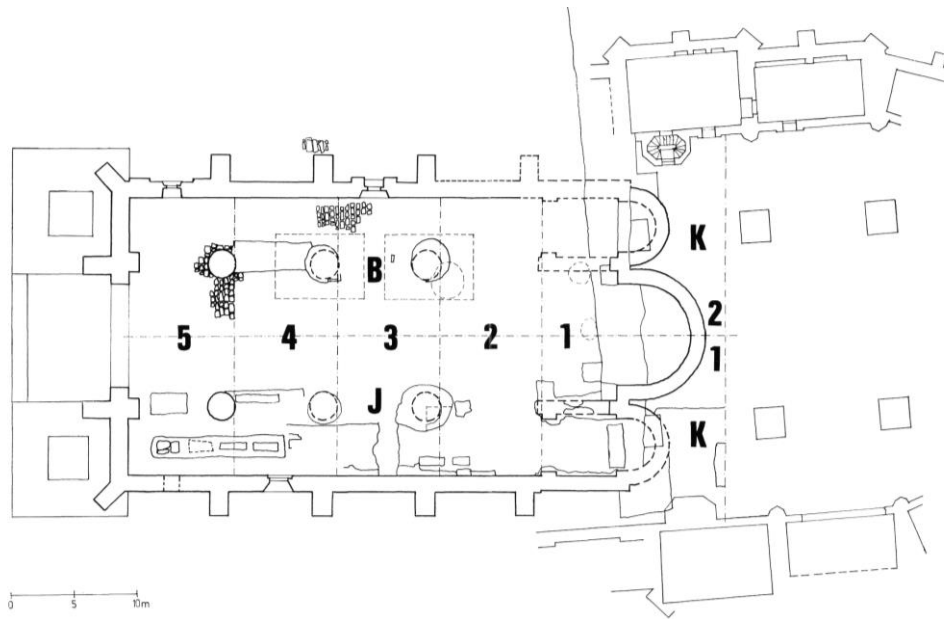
The plan of the first batch of excavations led by Károly Kozák (1965)
